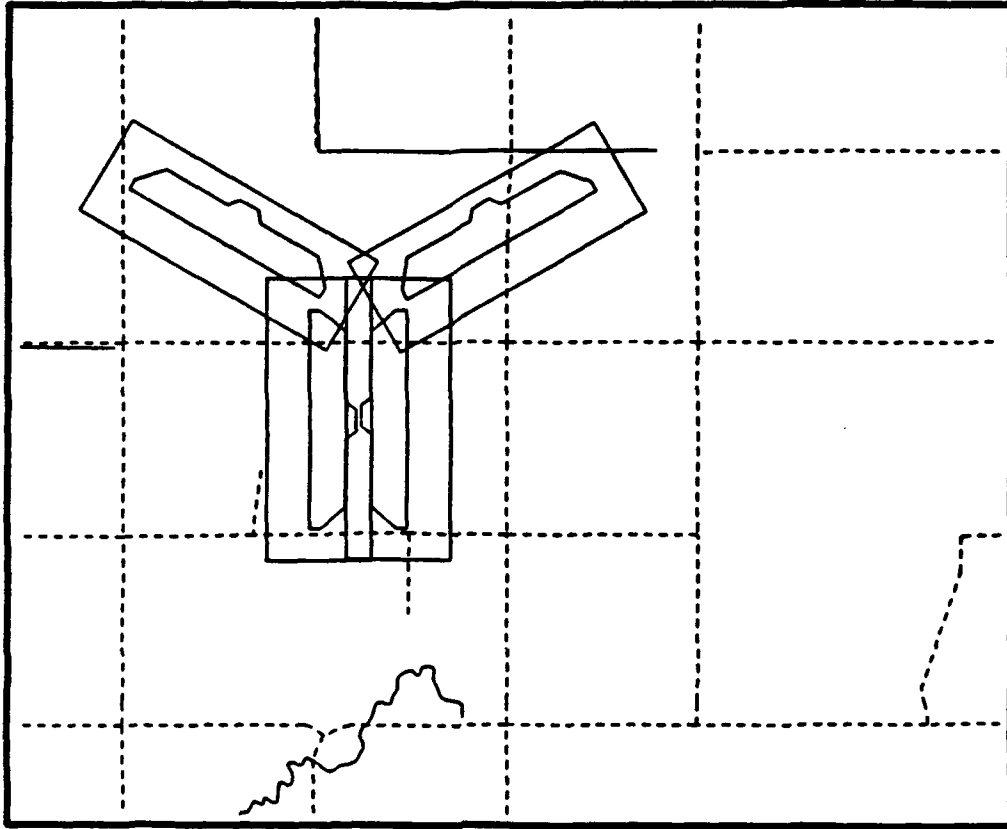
RX-WEST PRELIMINARY SITE LAYOUT
